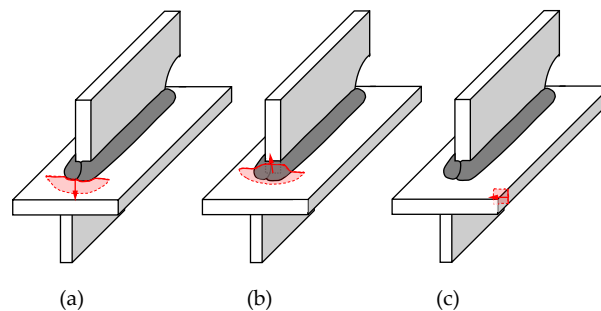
Observed failure locations in the specimens: from (a) weld toe, (b) weld root, and (c) thermally cut edge.
